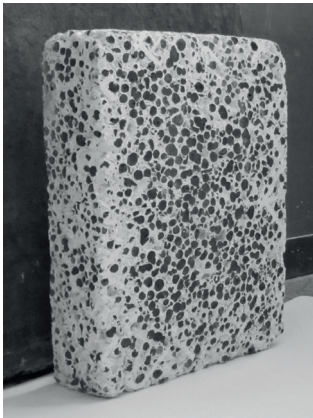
Experimental specimen – composite panel with dimensions $36 \times 27 \times 8.4$ cm
